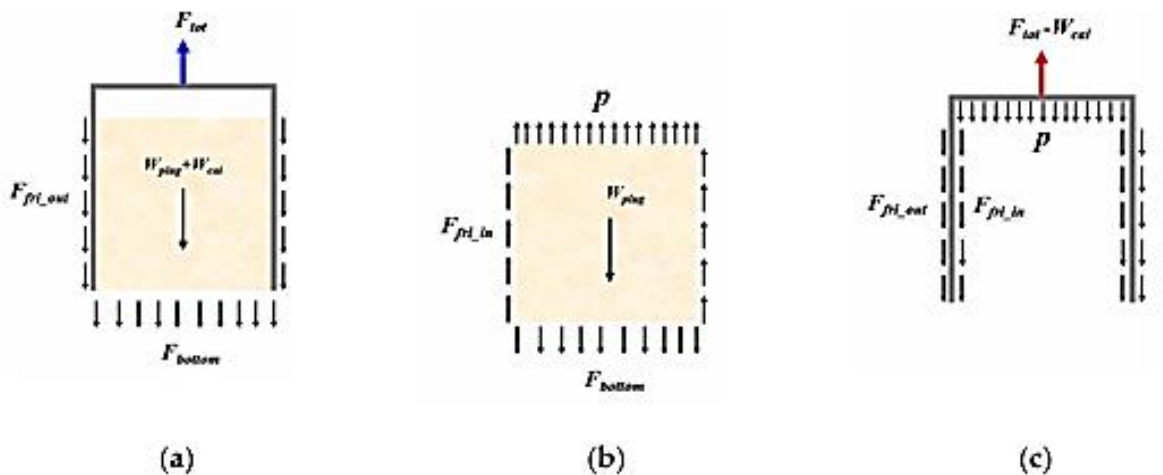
Bearing capacity mechanism a) overall bearing mode; b) soil plug module; and c) suction caisson module (Chenggen et al. [18]).
